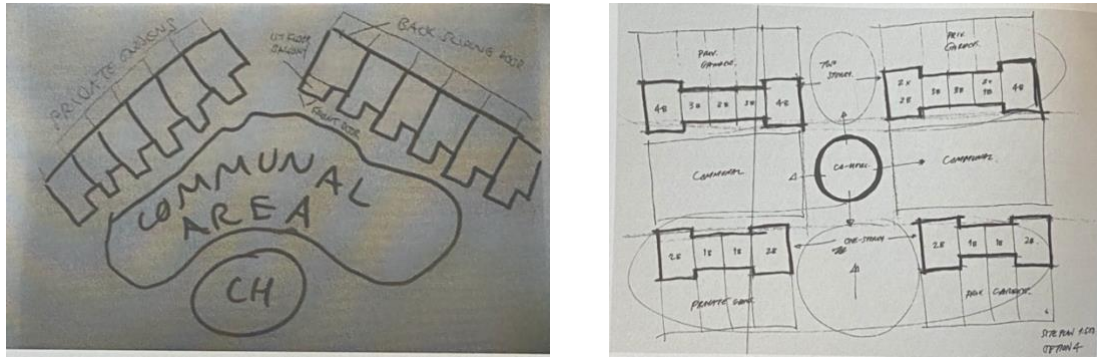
Paul's initial sketch of the layout of the blocks (L), Roger's sketch (R).
